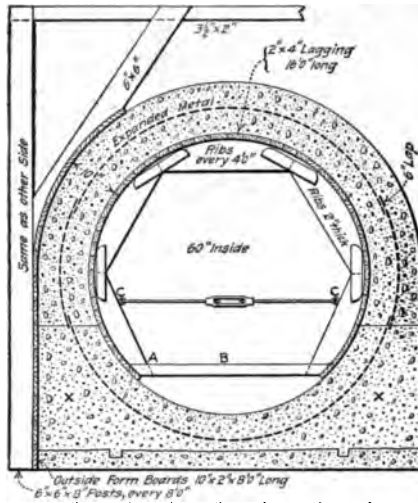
A.—Forms for Single Conduit, Cedar Grove Reservoir.
